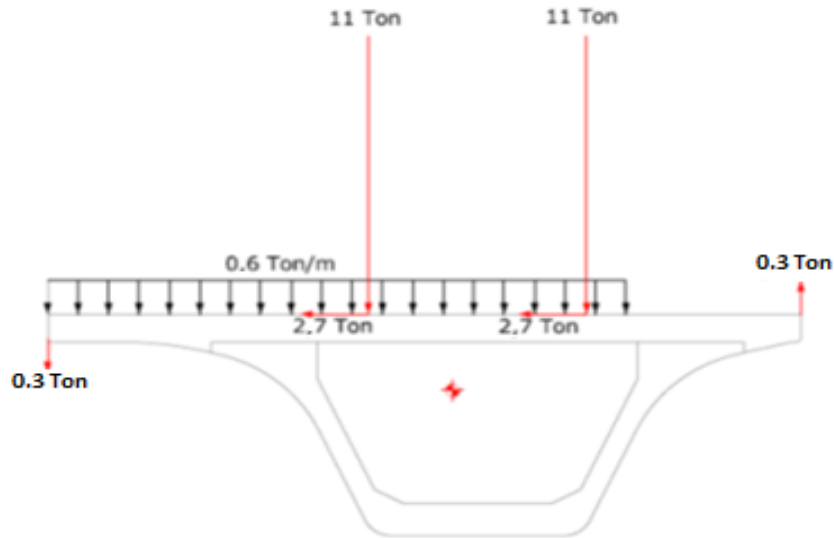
Application of vertical and lateral loads on the cross section (Bezgin, 2008).
